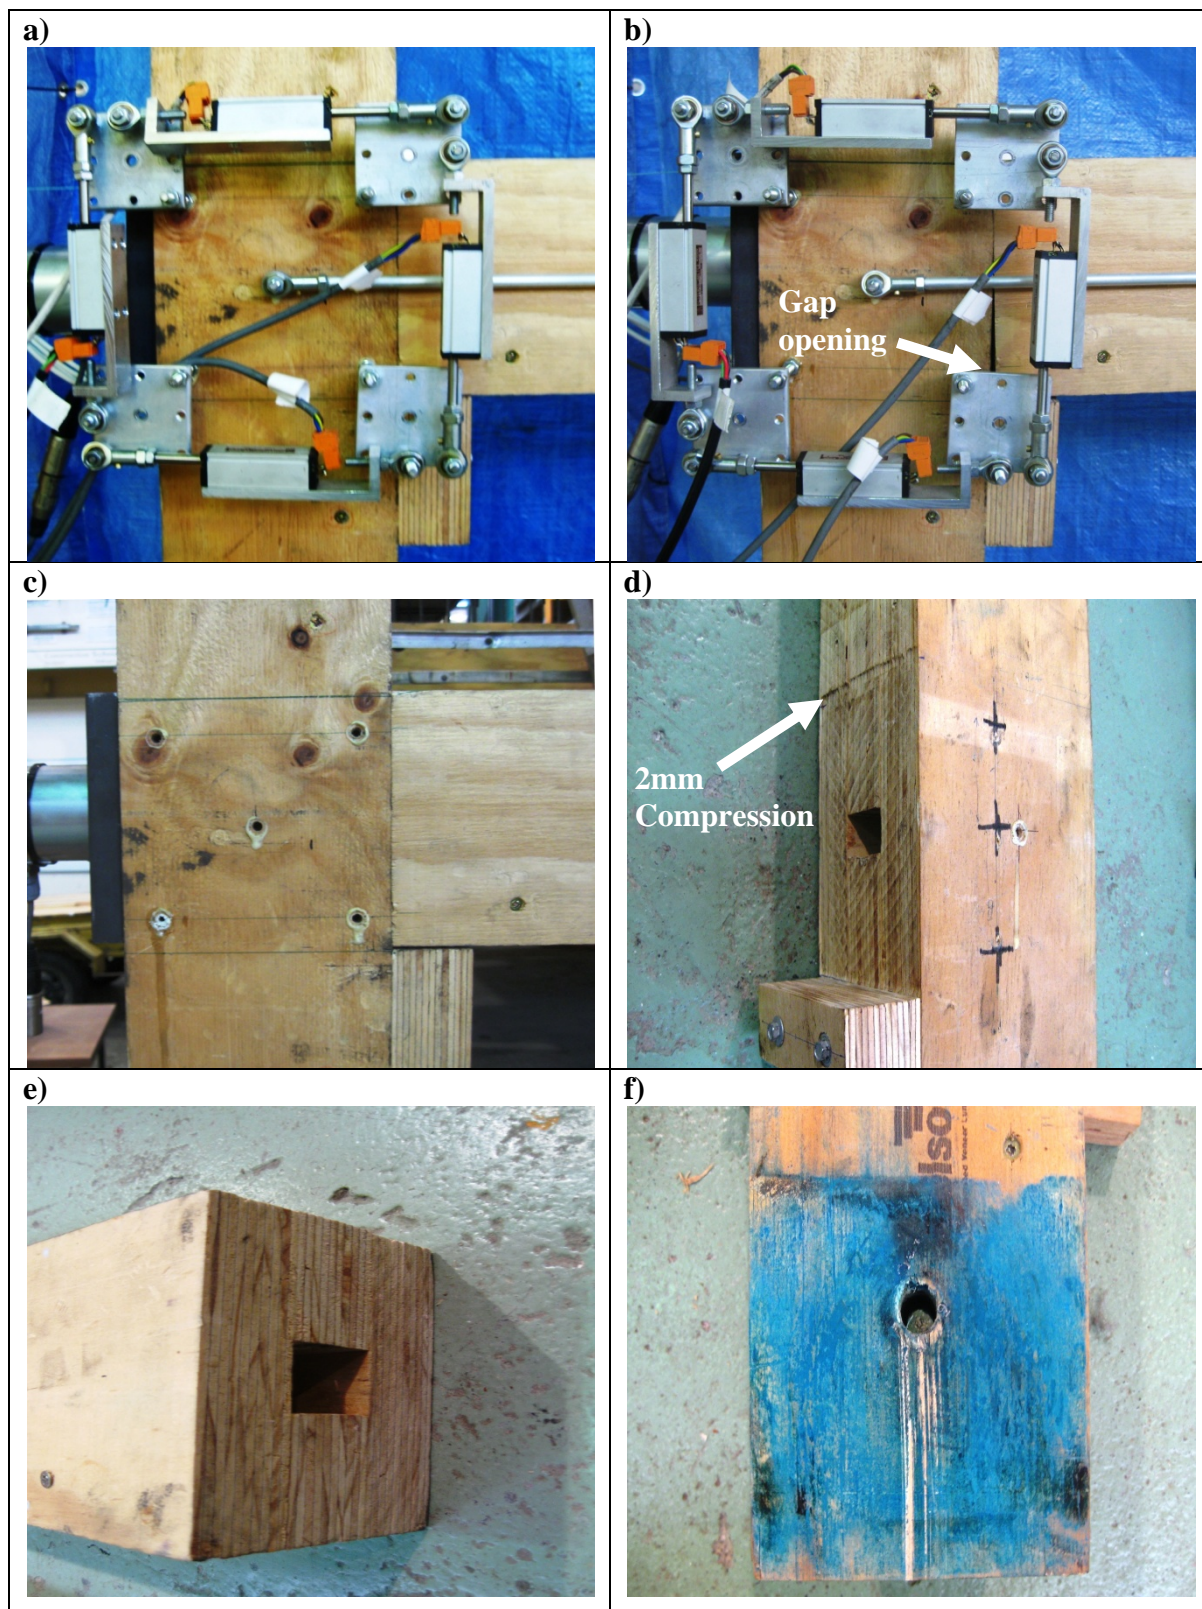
Quasi-static test, damage: a) Initial beam-column conditions b) Gap opening at 4.5% drift c) Final beam-column conditions d) Final accumulated damage at column e) Final conditions of beams (no damage) f) Final conditions of pin column connections (no damage)
